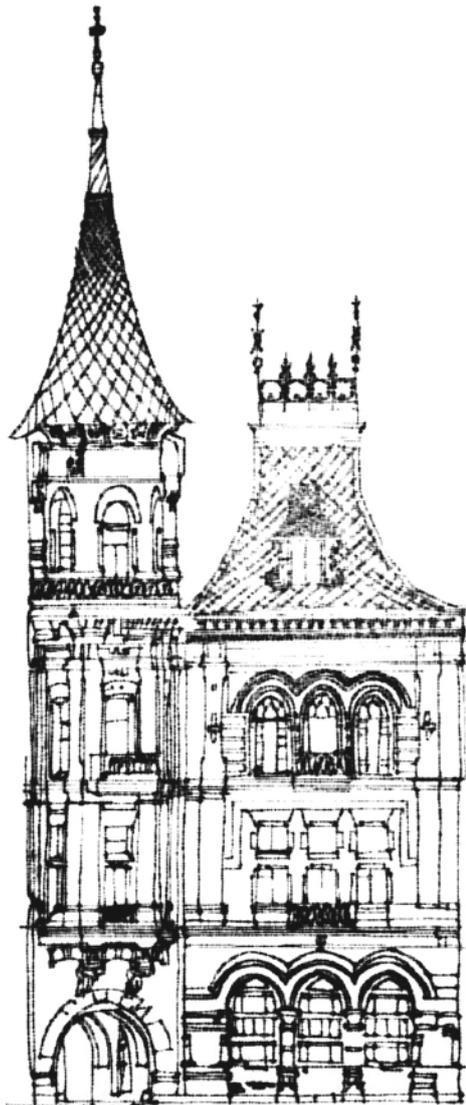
Sketch drawing of the main facade of the building at 1 Yaroslaviv Val Street.
